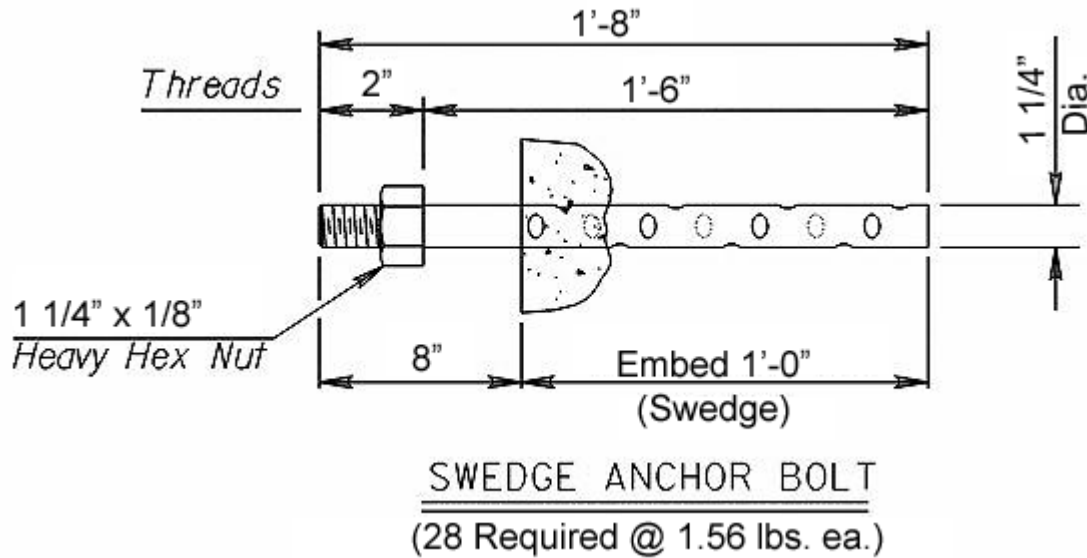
Typical Detail for Anchor Bolt (note: embed into support 12")
